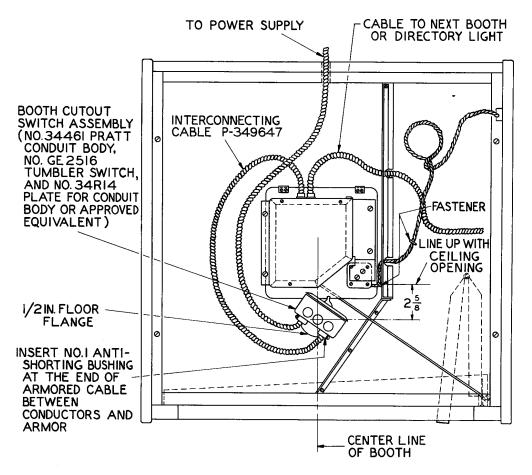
Typical Cutout Switch Installation with 4-Type Light Fixture
